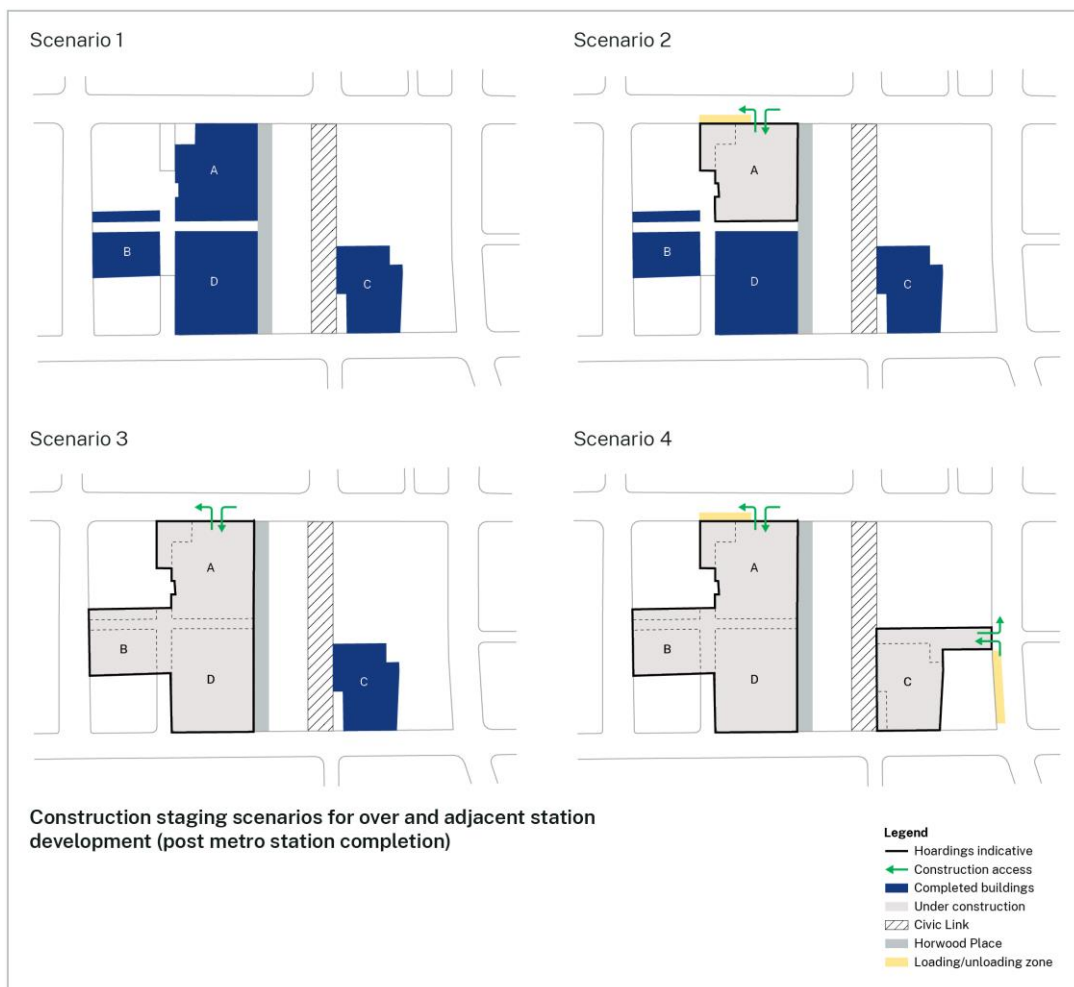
Proposed site materials handling demarcation plan post metro station completion
